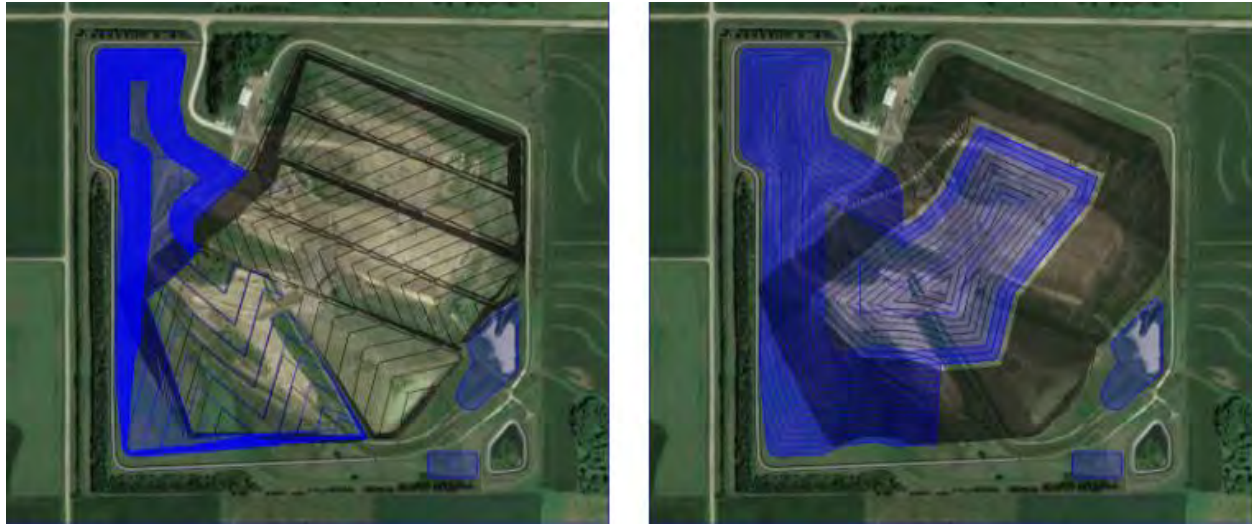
NNSWC Expansion Alternative 1 Base Grades (left) and Final Cover (right)
